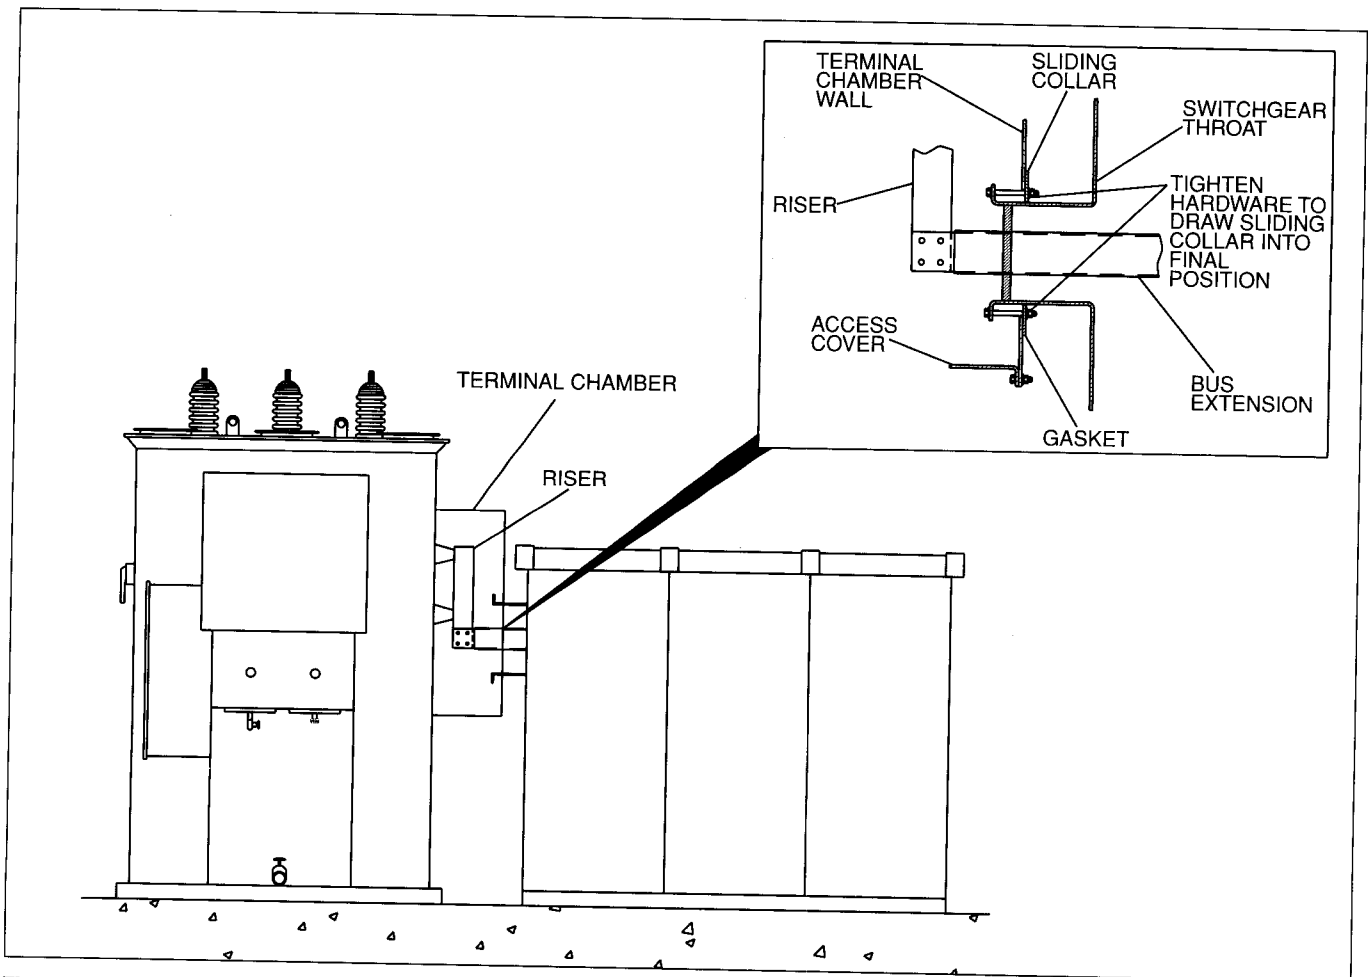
Connecting Transformer and Switchgear for Typical Outdoor Installation
